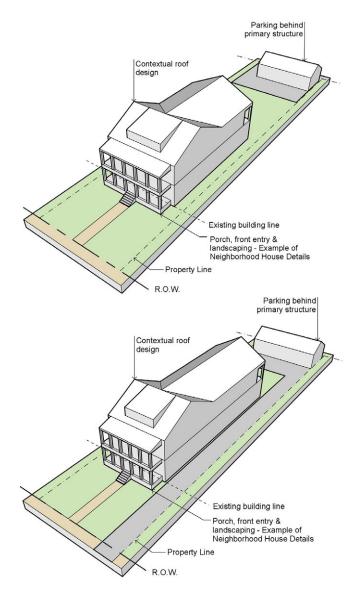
Illustrative massing for CRN lots. Alley-loaded parking (top) and Street-loaded parking (bottom).
